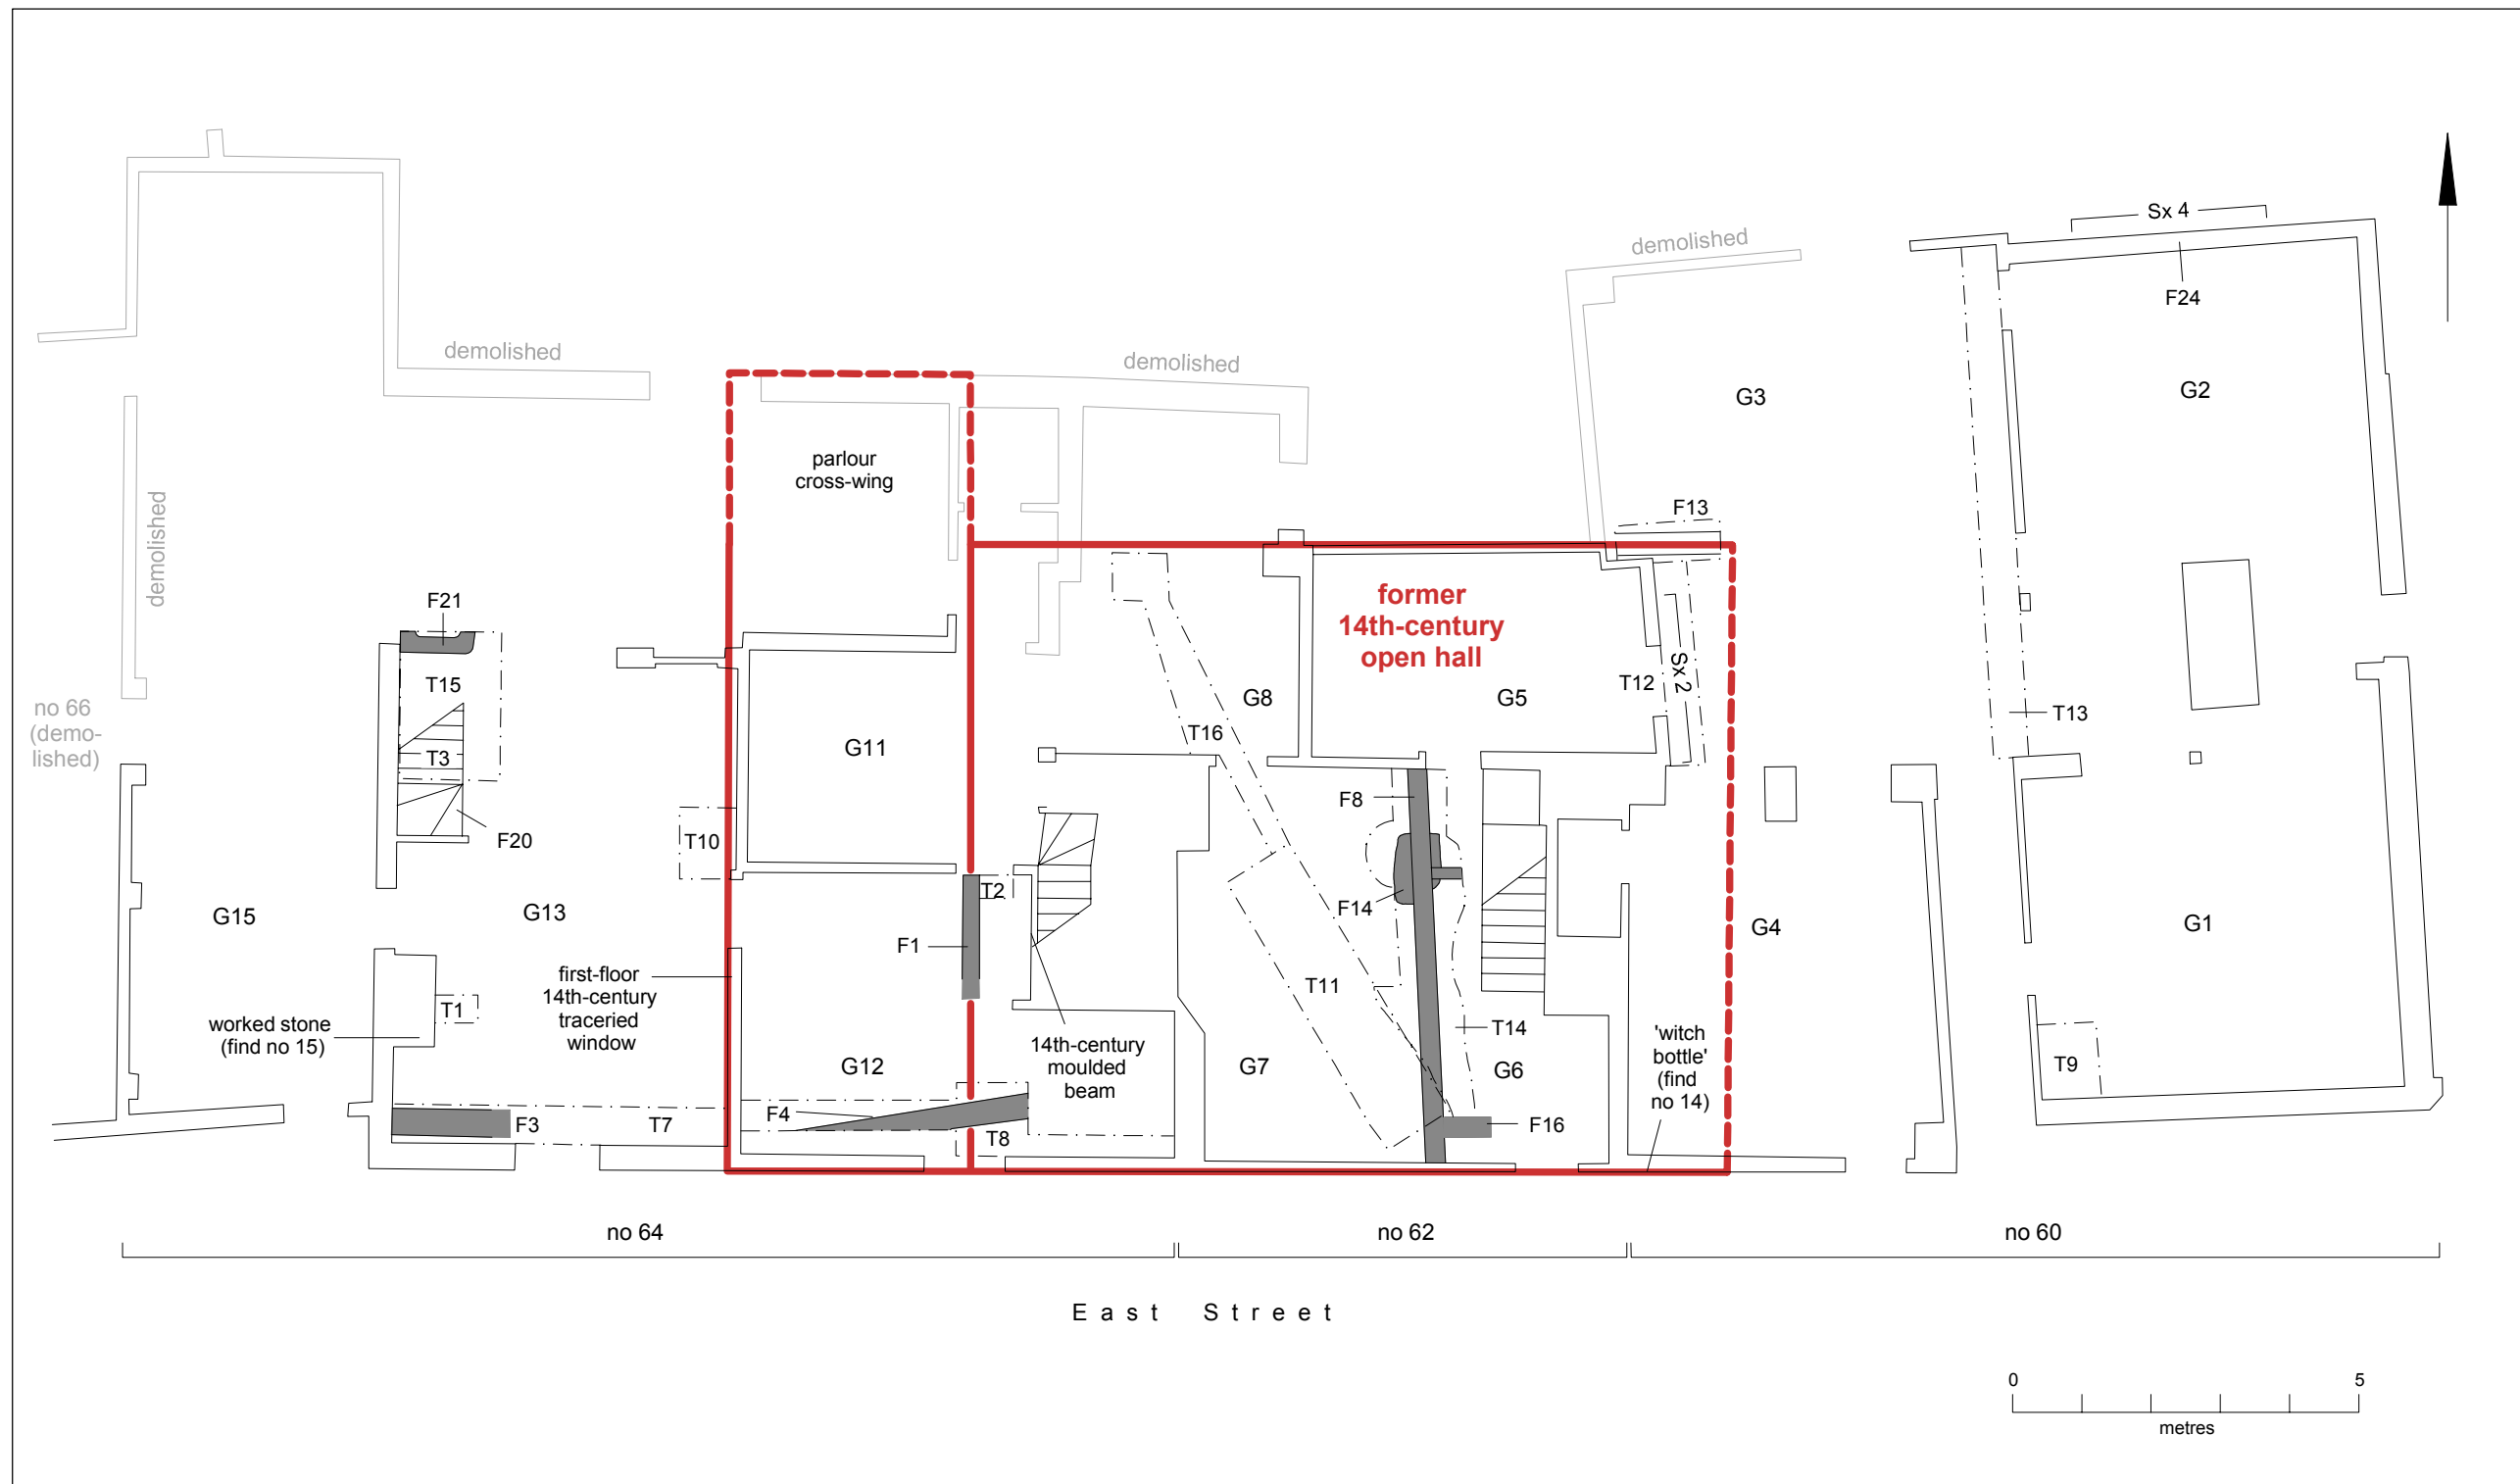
Plan of 60-66 East Street, showing the trenches and main archaeological features (shaded).
